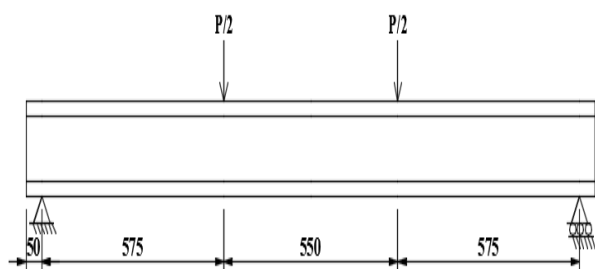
Details of loading and geometry of girder HFSPG5 [18] (dimension are in mm)
